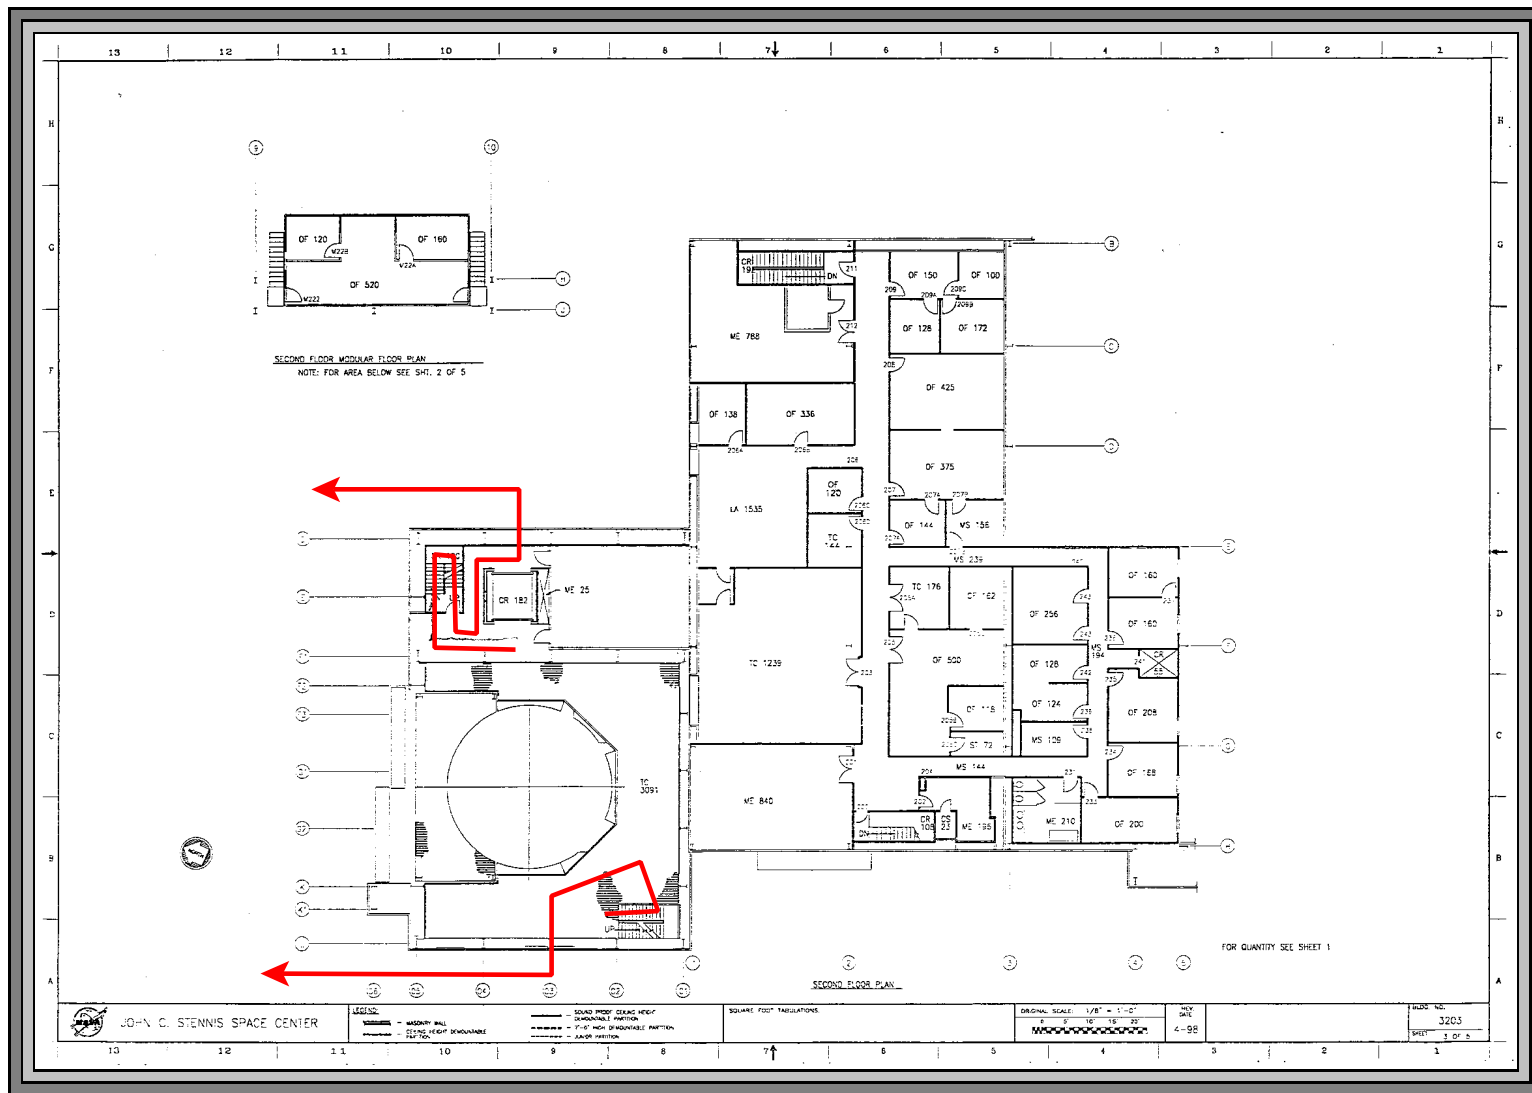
Figure C. Emergency evacuation routes via the east and west stairwells and ground floor exit doors from level 2 of the NMFS-SSC facility located in building 3203.
